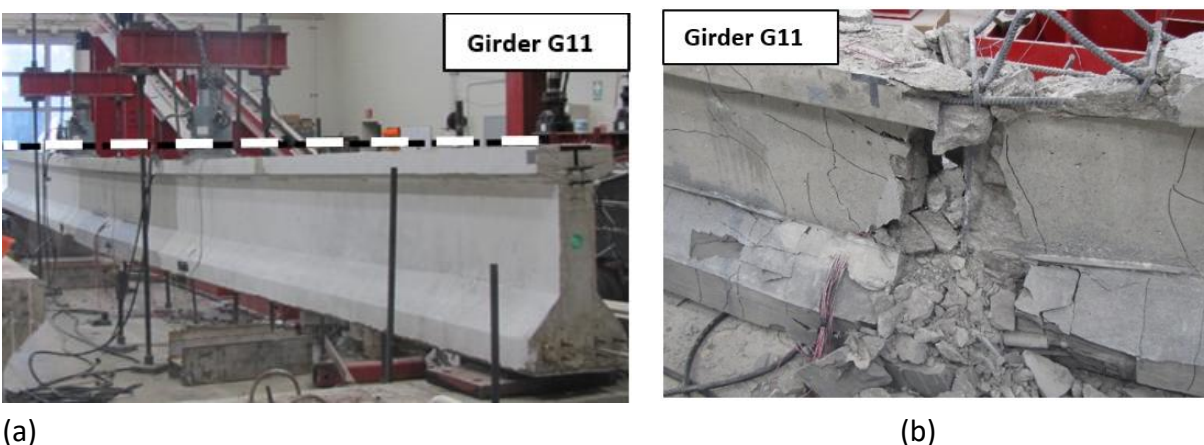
Girder G11 (a) Deflection of the girder during testing, (b) Failure of the girder
